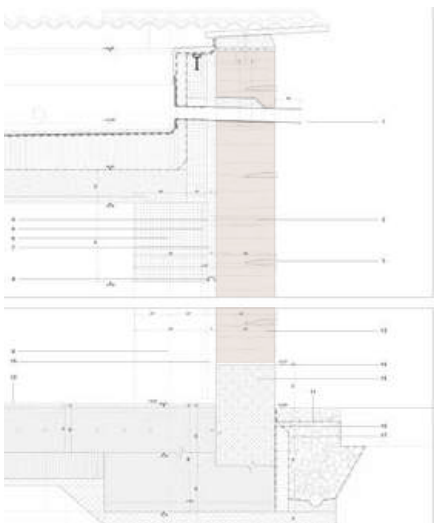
Detailed section (Adapted from Arquitectura Viva, n.d)
